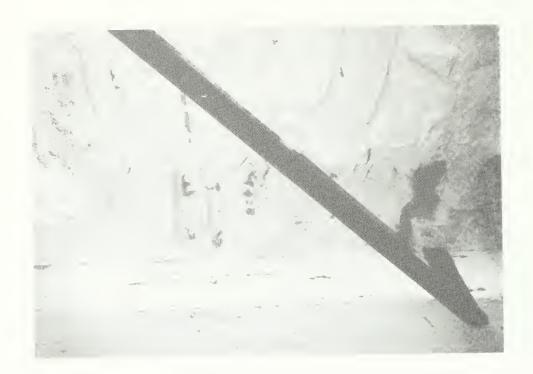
Cellar hall (Room 001), north wall of bulkhead, showing former location of doorway jamb.
